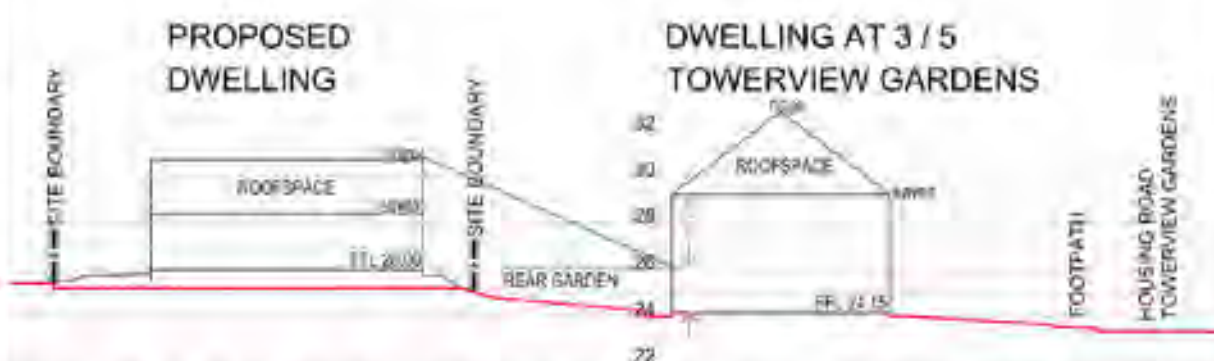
25 degree light test from rear of properties within Towerview Gardens
